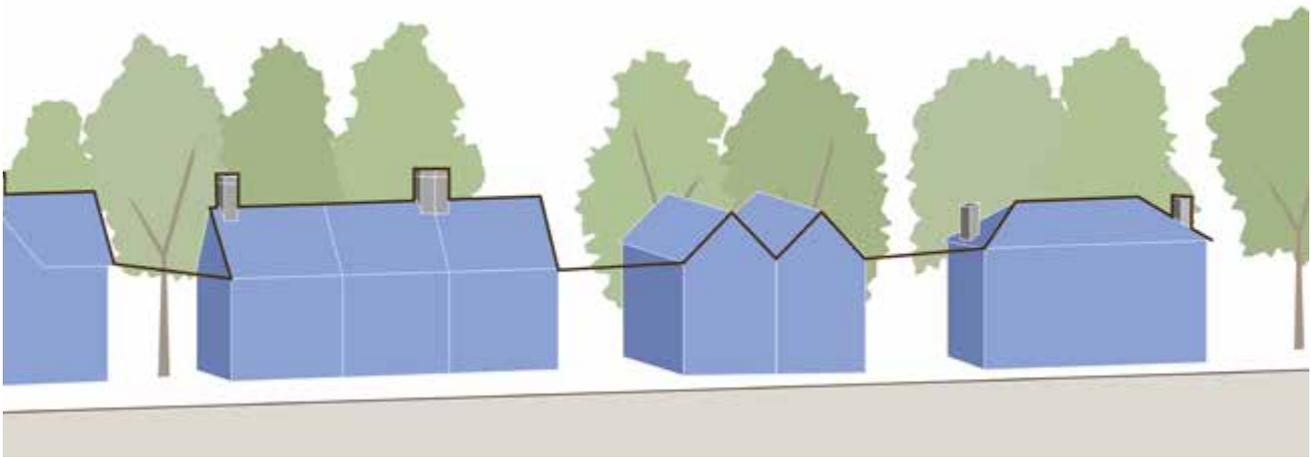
Diagram illustrating how variety can be introduced in the roofscape.
